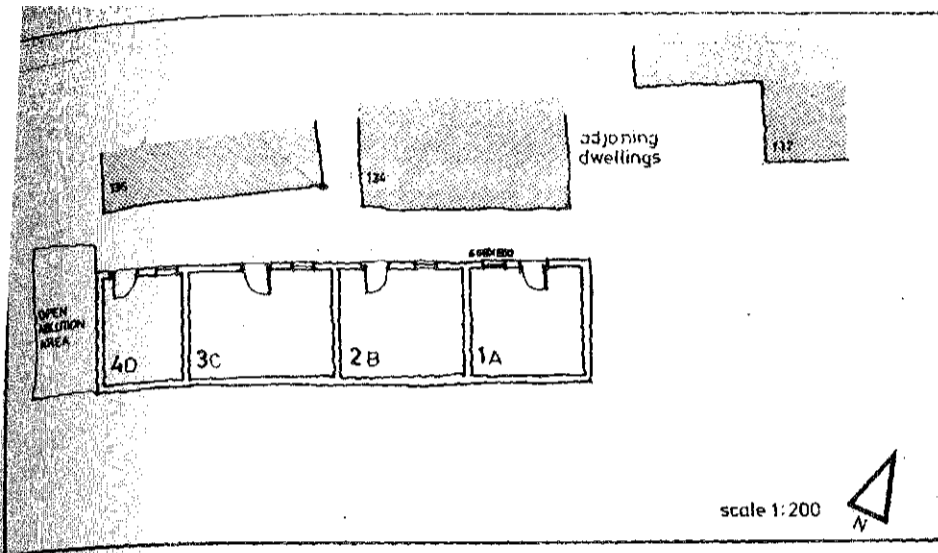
LINEAR DWELLING WITH EXTERNAL DOOR ACCESS
